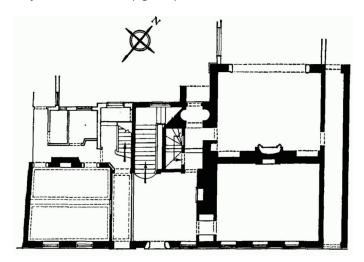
Ground floor plan by the RCHME (1981), with later walls unfilled and representing the C19th subdivision of nos. 29 and 31. Note the dividing wall now separating the entrance hall to create a narrow hall for no.29.
